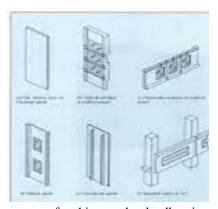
Various types of architectural loadbearing wall panels bearing walls
